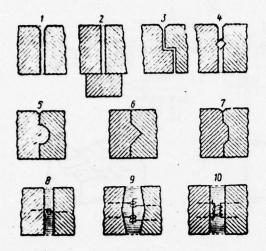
Designs of joint connections in prefabricated pavement slabs: 1-connection with butt end "butts"; 2-connection on foundations; 3-connection "in quarter": 4-dowel connections; 5,6,7-grooved connections; 8-connection with a weld or with screwing together of the reinforcement: 9-connection of the reinforcement eyelet with a dowel; 10-connection of the reinforcing brackets with a helix.
